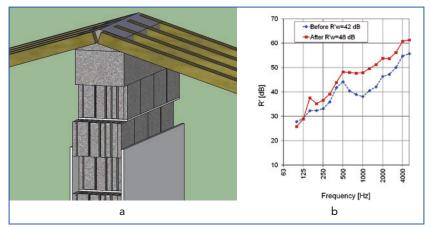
a) Example of a critical joint between the separating wall and the roof, b) Case study: airborne sound insulation of a wall before and after the filling of the cavities between the roof and the wall.
